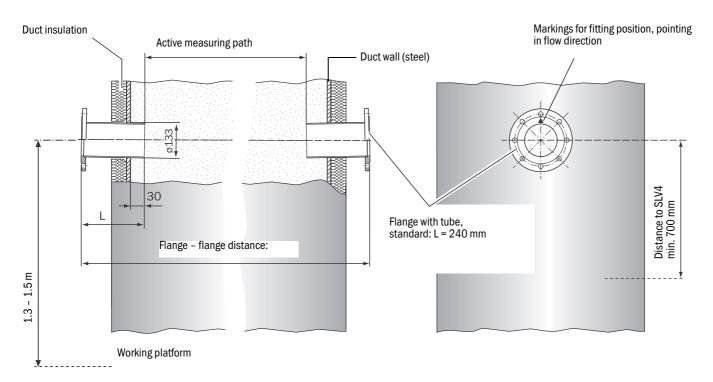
Fitting recommendation for the mounting flange (duct diameter not representative)
